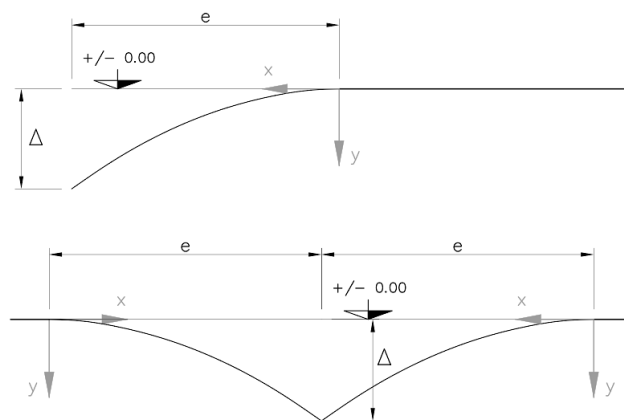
Loss of support: cantilever at the extremes of the floor and sag at centre of the floor
